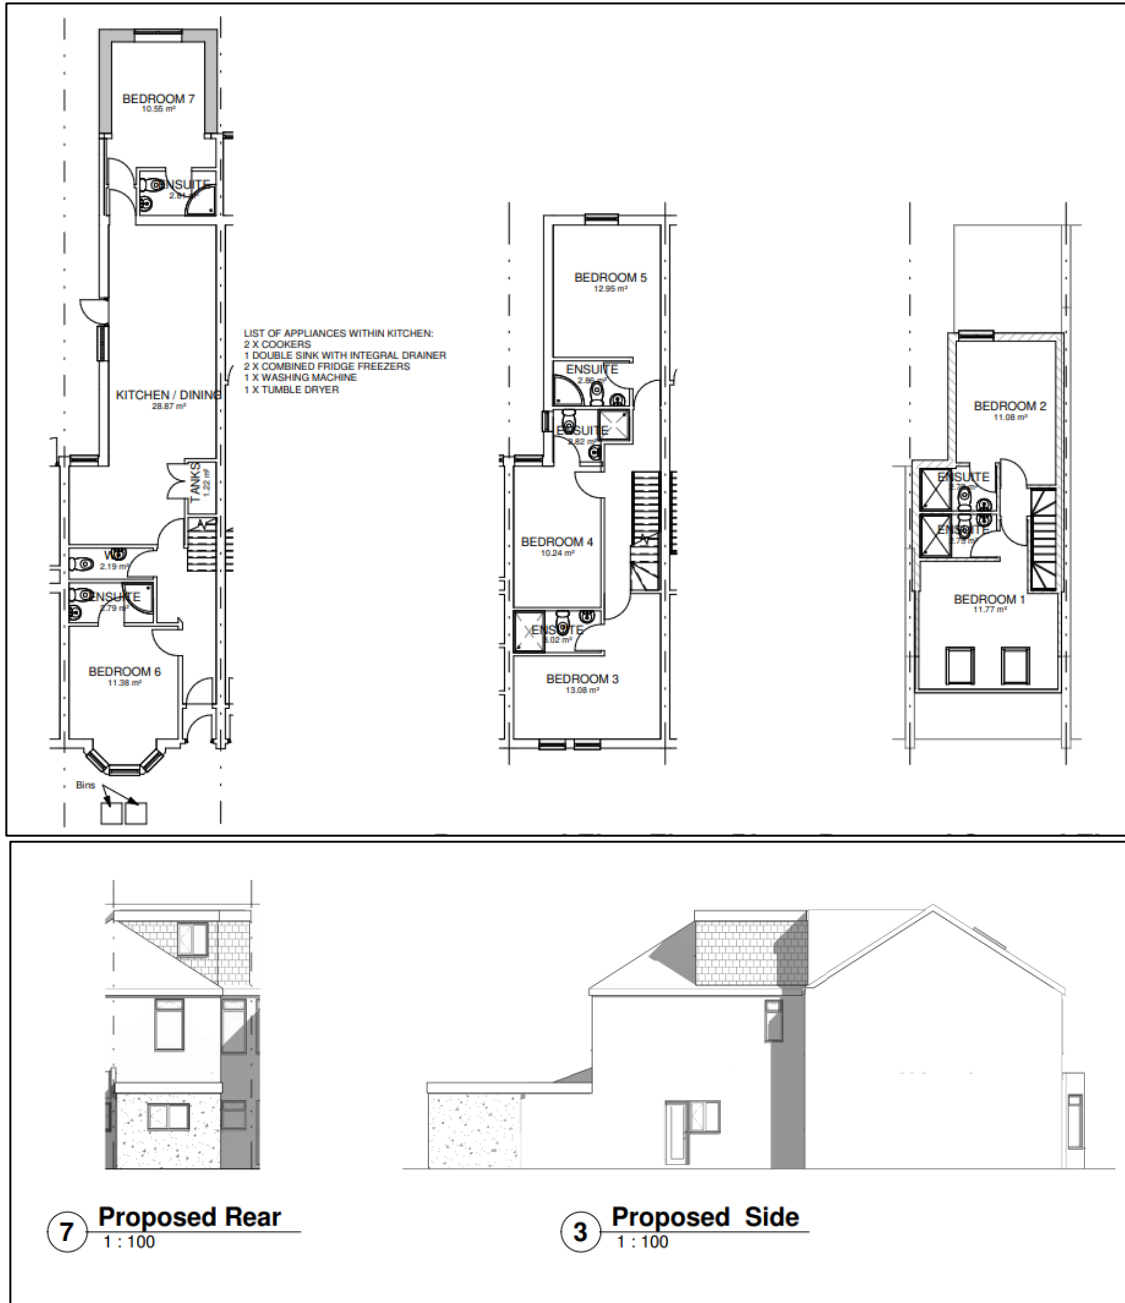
and 3 - Proposed Floor Plans and Proposed Elevations
